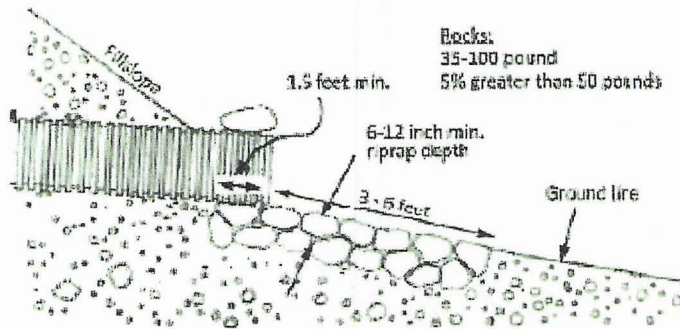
A. Riprap armor at culvert outlet (Modified from: Keller et al., 2011).
